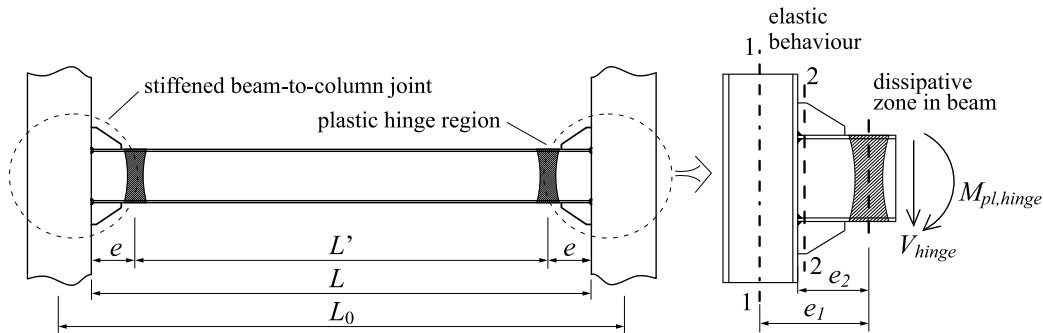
Typical beam span with stiffened joint, plastic hinge location and cross-sections used for design check
